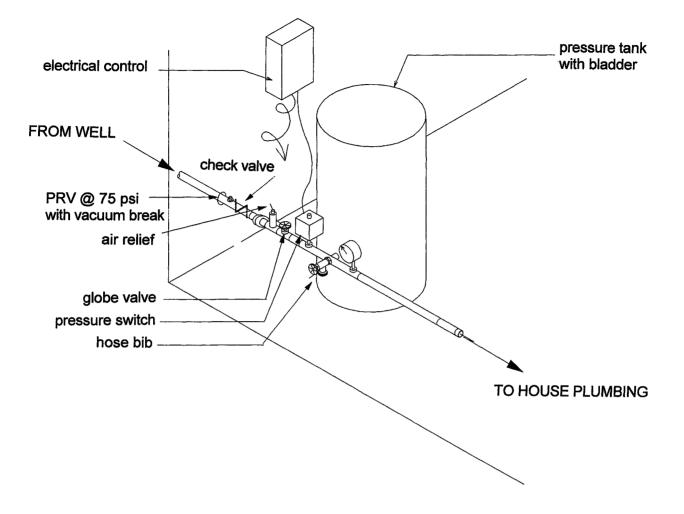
TYPICAL PUMP PRESSURE SYSTEM WITH WELL LINE DRAINBACK
